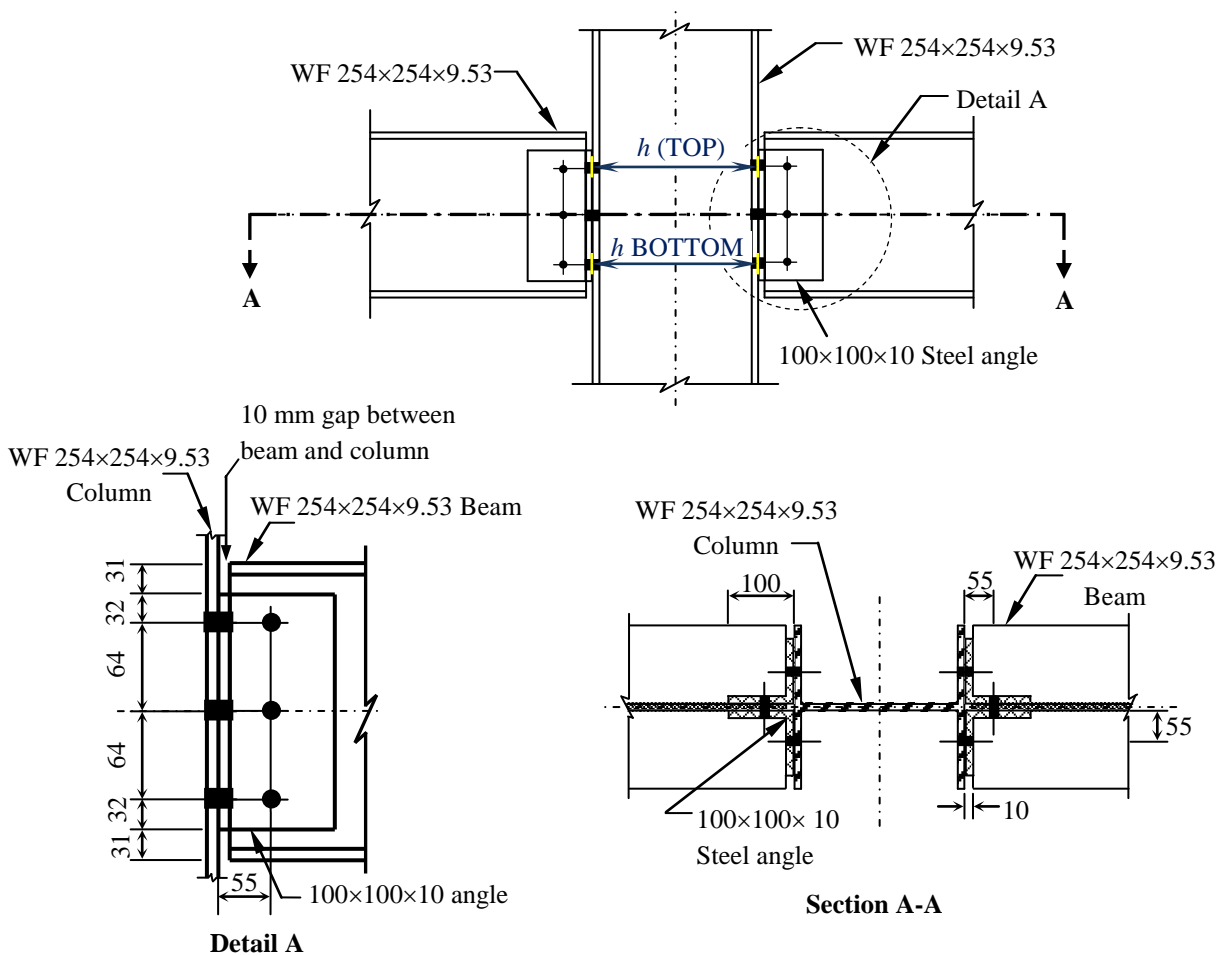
Connection details for beam-to-column joint tests with structural steel cleats (All dimensions are in mm).
